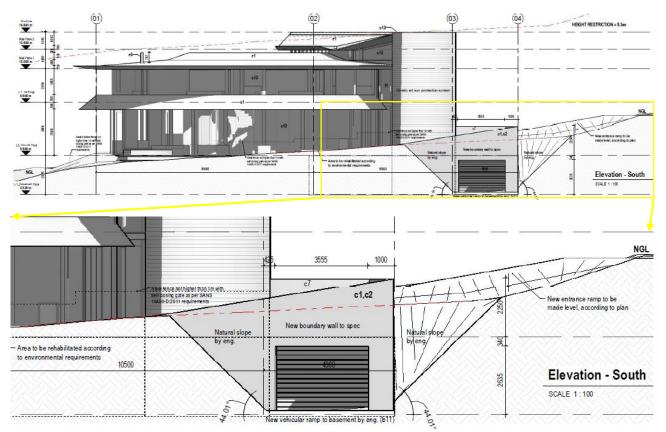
South Elevation Plan of new house on Erf 222 indicating basement garage & sloped embankments on either side of subsurface driveway ramp.
